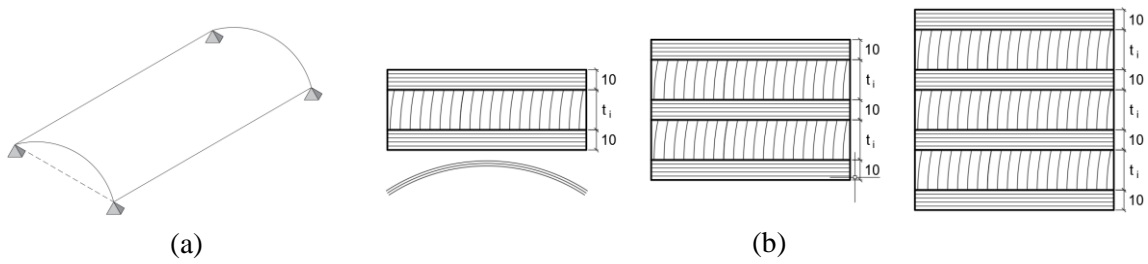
a) Boundary conditions for a general panel configuration, and b) Cross-section configuration of the panels (3-, 5-, and 7-ply).
